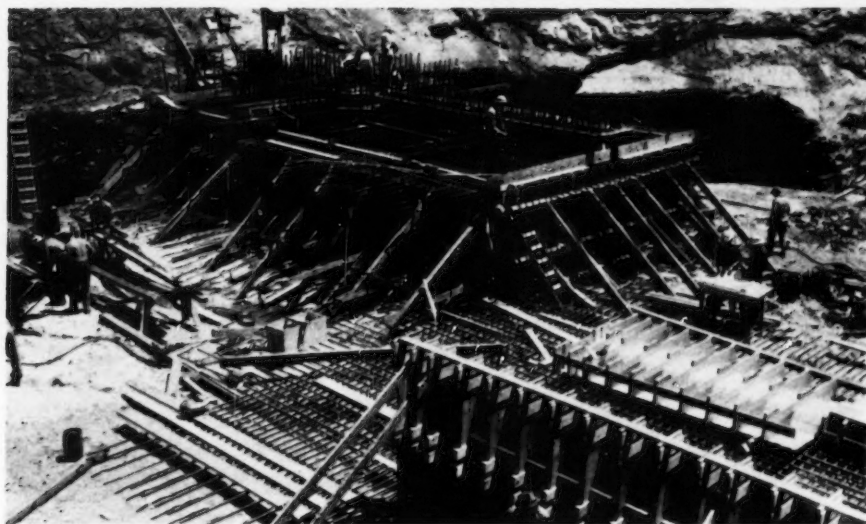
Shop-fabricated panels for the substructure were sheeted in a horizontal direction with 6-inch shiplap and braced externally.
